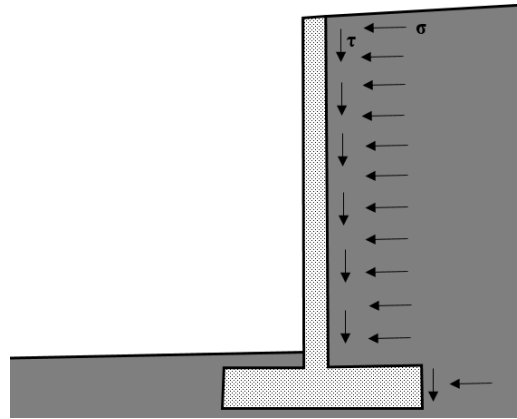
Retaining wall example with lateral earth pressures shown (from Coduto et al., 2011)
